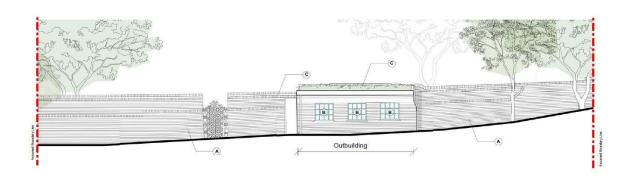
Proposed rear elevation as viewed from No. 20 Perrin's Walk
